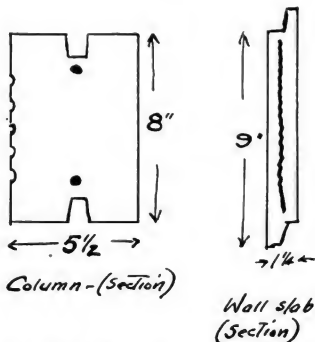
SECTIONAL DETAILS OF COLUMN AND WALL SLAB SHOWING GENERAL ARRANGEMENT.
